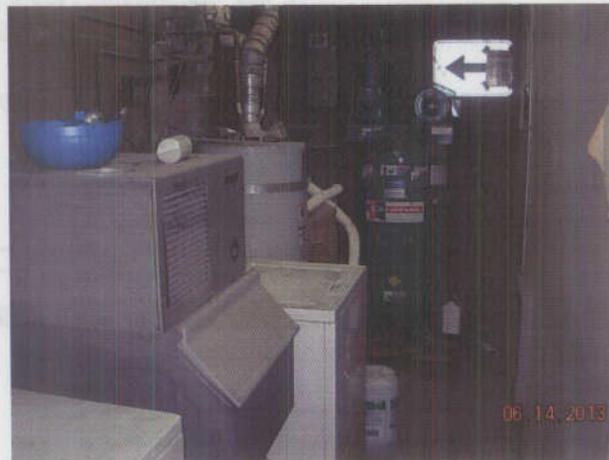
Water heater room 2 (with asbestos pipe insulation), Woodfords MS
